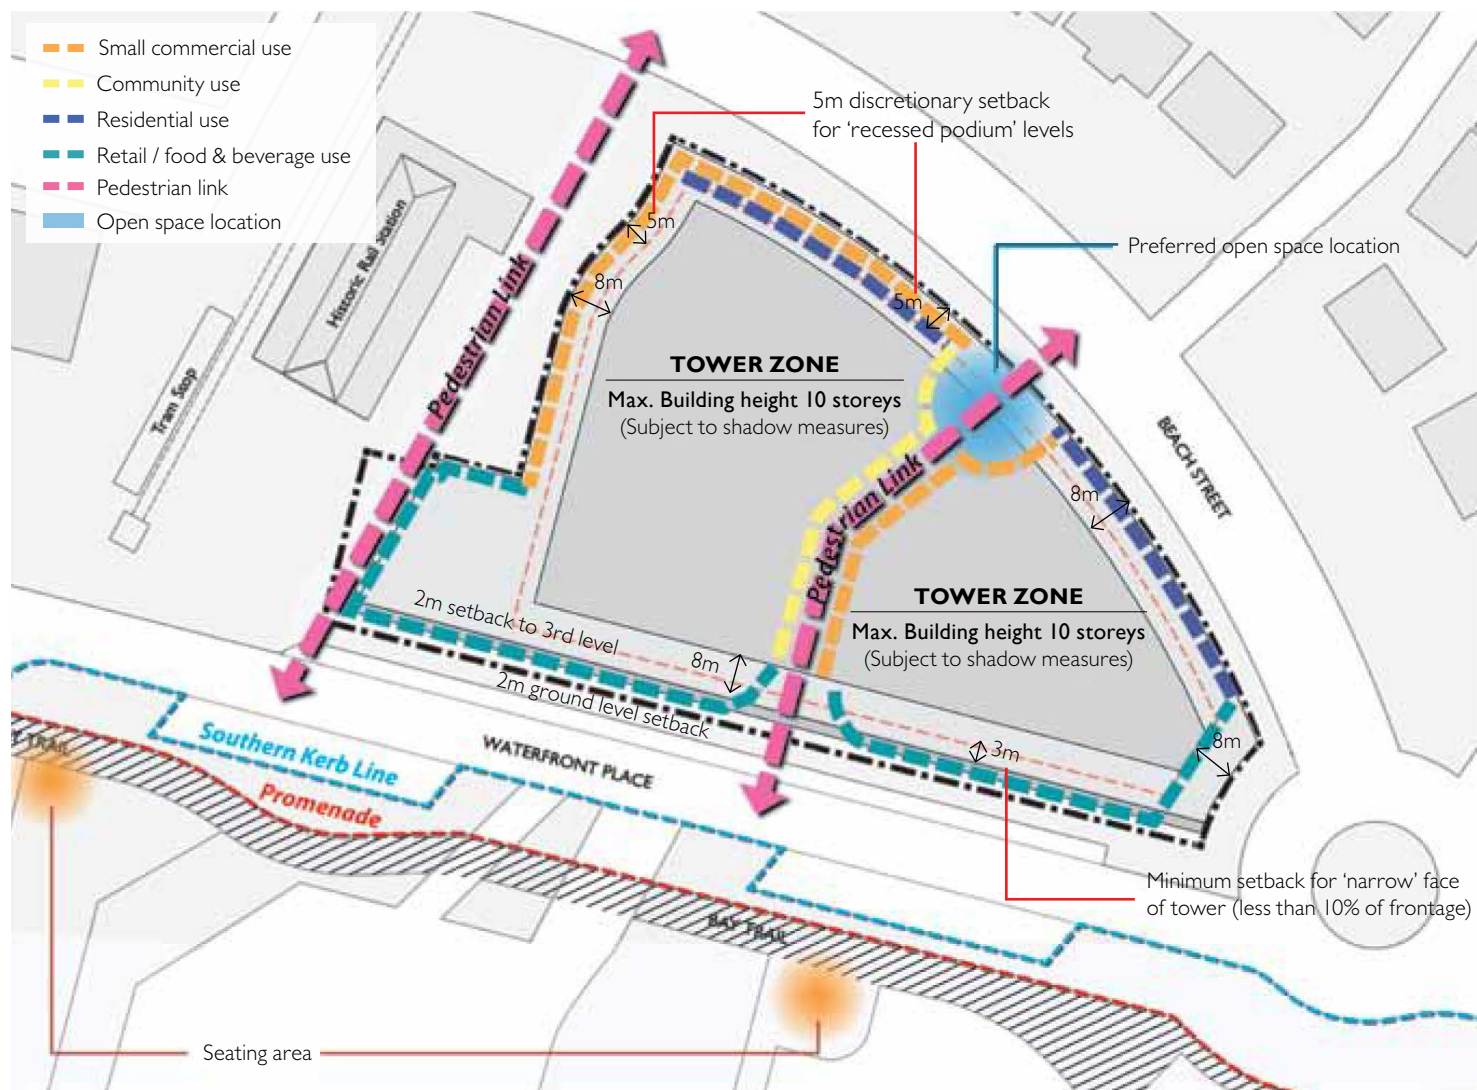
BUILT FORM DESIGN FRAMEWORK AND PREFERRED LOCATION FOR GROUND FLOOR USES (ADAPTED FROM I-7 WATERFRONT PLACE - DESIGN GUIDELINES)
